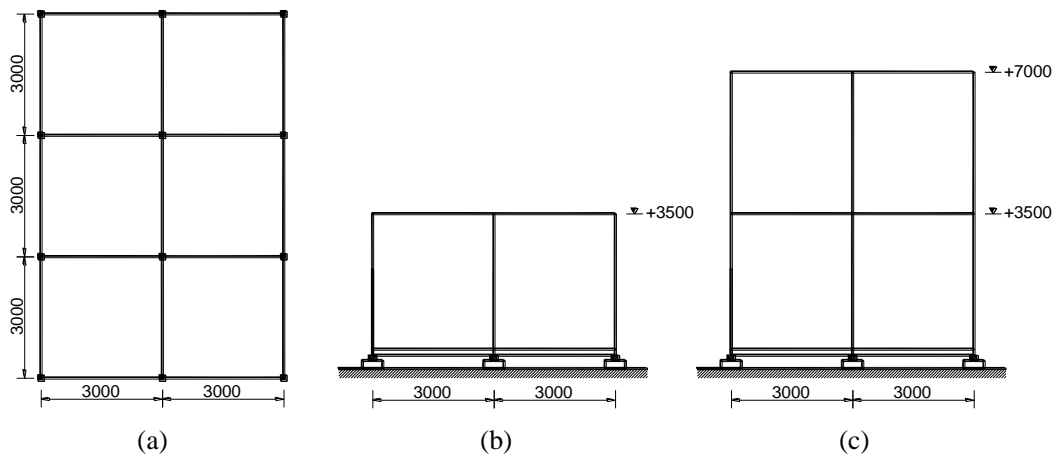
Analytical models of isolated frames: (a) Plan view; (b) Elevation of one-storey building; and (c) Elevation of two-storey building.
